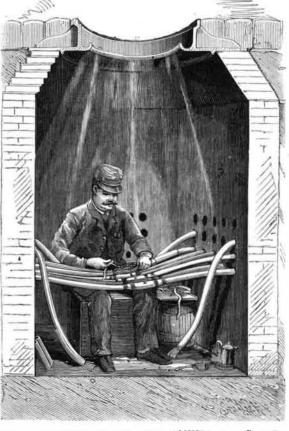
SPLICING WIRES AND CONNECTING CABLES.
